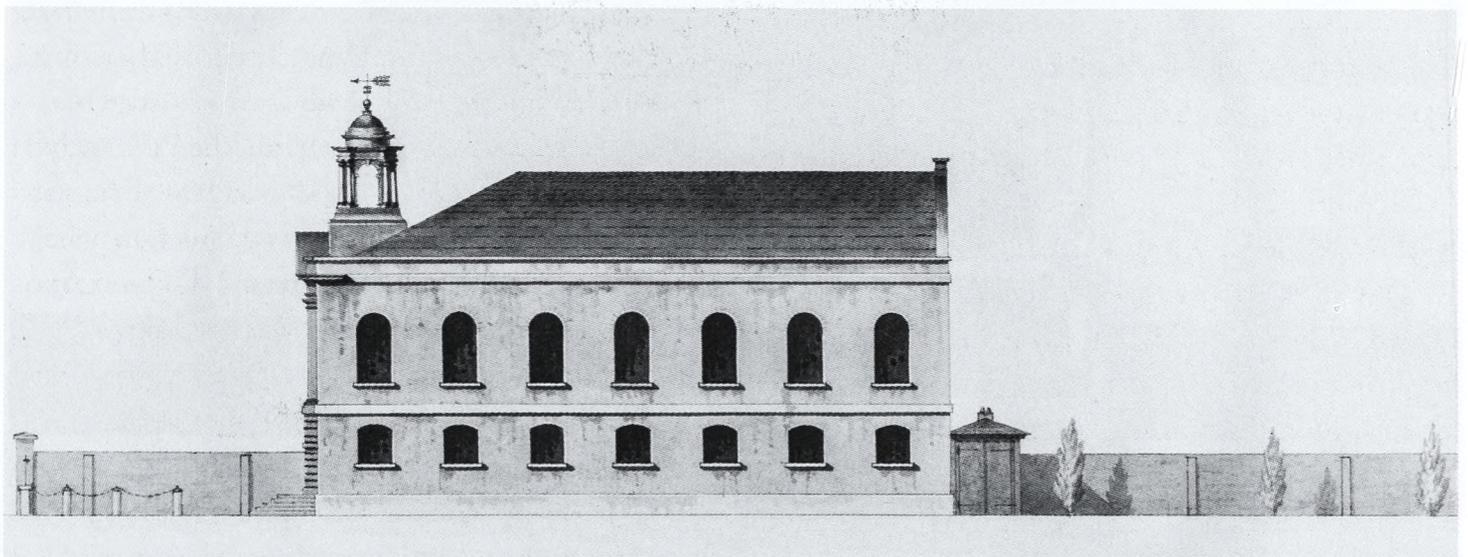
Thomas Hardwick Jr., drawing of the south elevation for St James's, Hampstead Road, London, 1789–90.
